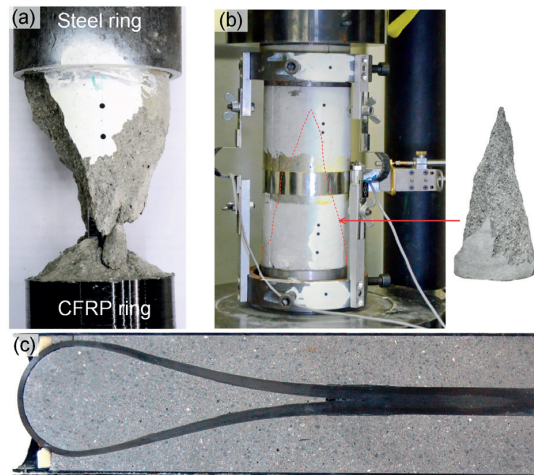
Failure mode of anchor C380-2: (a) double-cone failure of unconfined grout; (b) similar failure mode in uniaxial compression experiment G1; (c) undamaged strap in confined part
